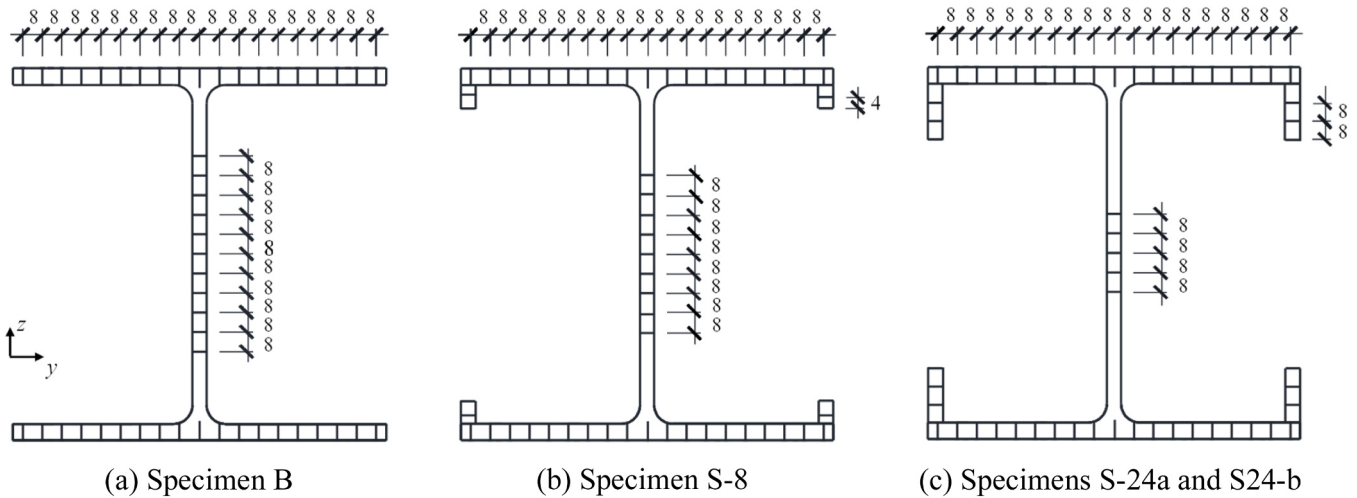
Cross-sectional layout for residual stress measurements (locations of gauge holes are shown, with dimensions in mm).
